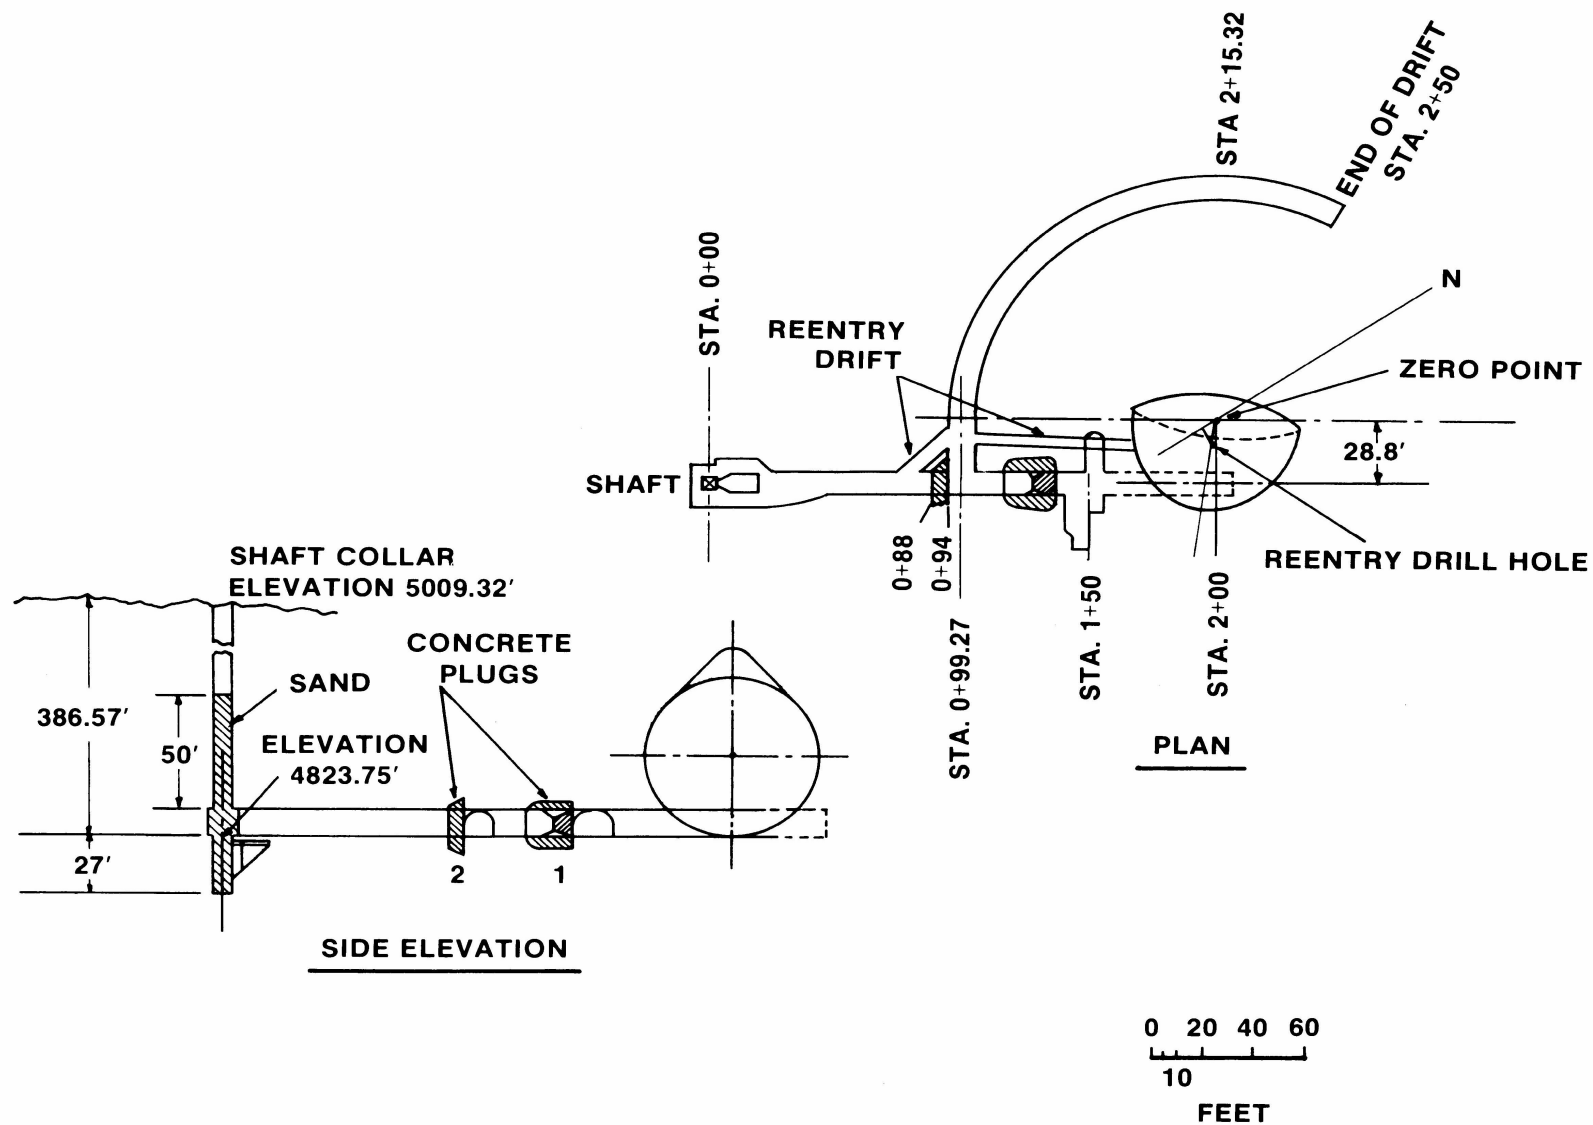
Plan and elevation of the Tiny Tot nuclear test (Brady et al. 1984:216).
